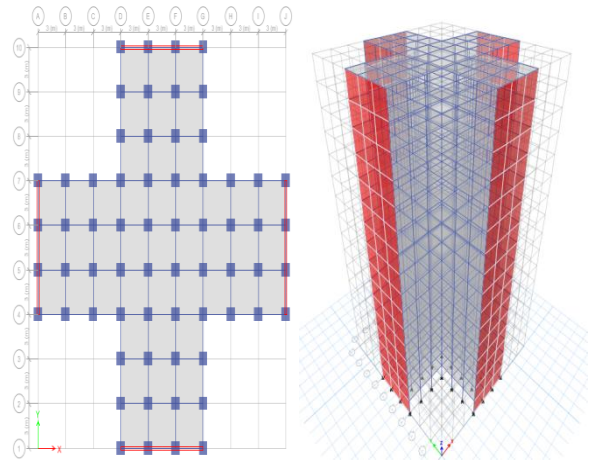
Plan and 3D view of building with shear wall provided at sides (full height of the building)
